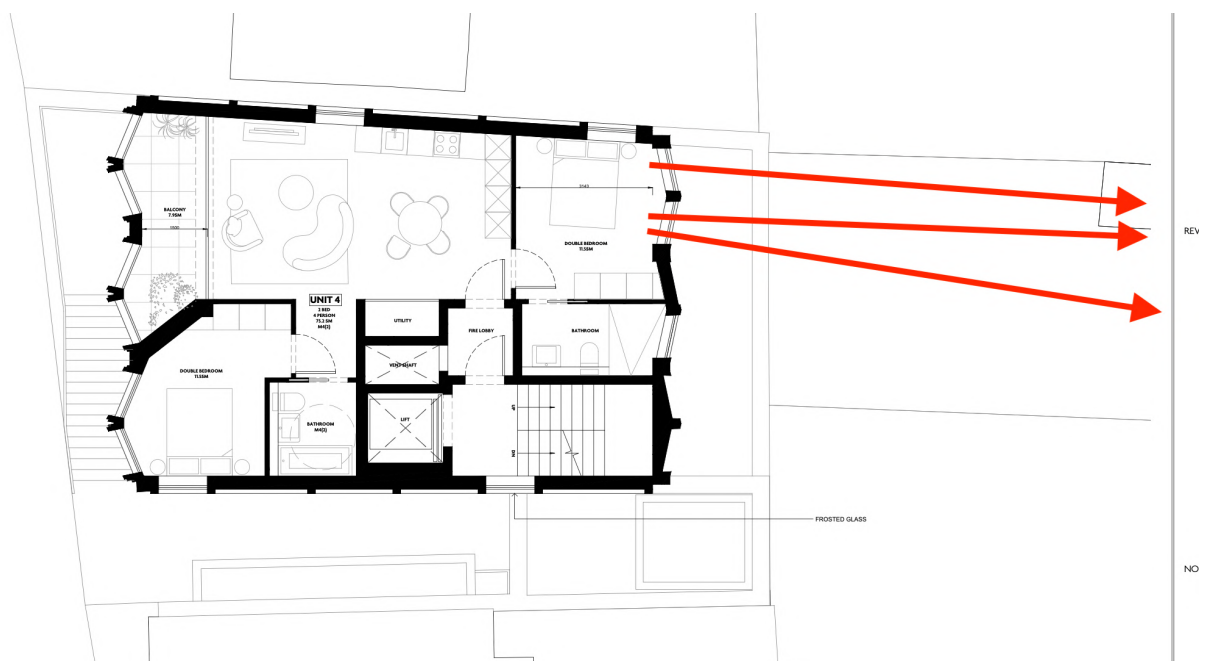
Extract of floor plan show example of view lines across and down into no. 4 Chetwynd Villas only.
